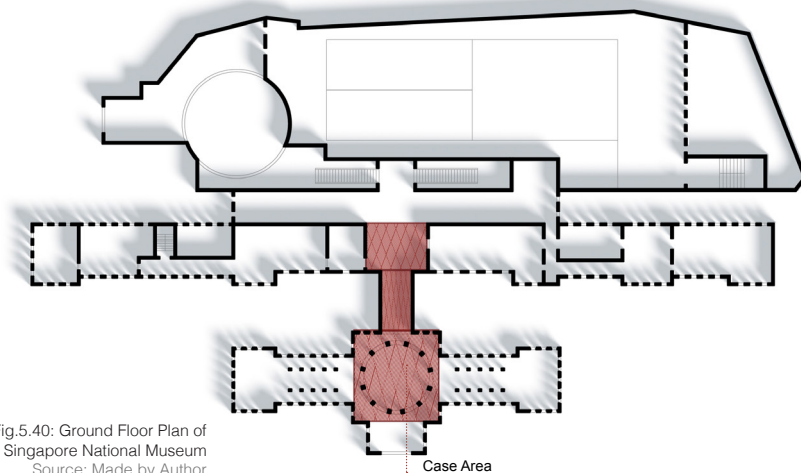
Ground Floor Plan of Singapore National Museum
